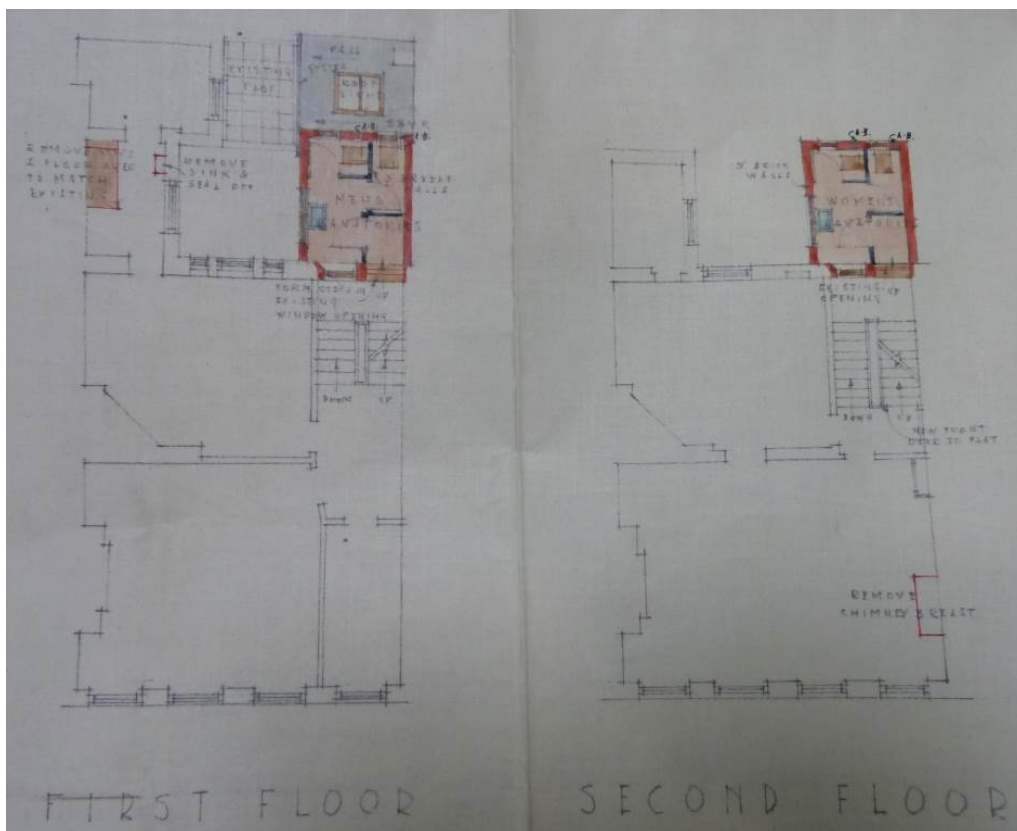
Proposed first and second floor plans, J. Mackie Murray ARIBA in conjunction with Lawrence Farman FRIBA, February 1947 (LB Camden, planning file)
